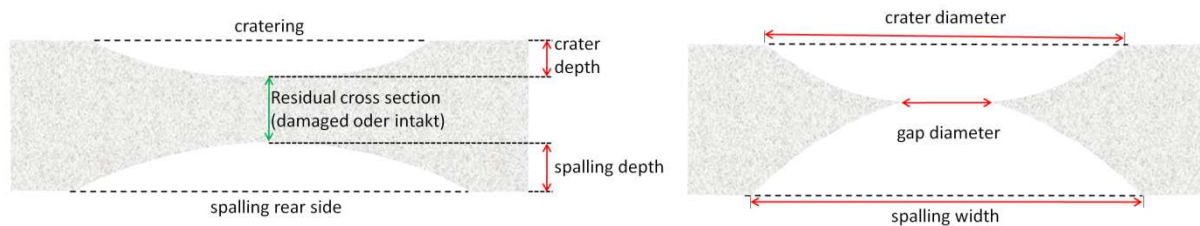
Potential damaged zones in a reinforced concrete component due to a contact or close-in detonation
